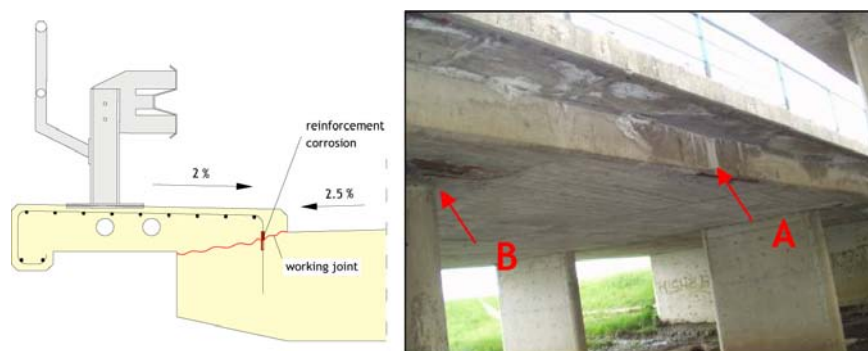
Cross section of the cantilever and deck slab edge with marked working joint and location of reinforcement corrosion; Photograph: A-water penetration through working joint, B-leaking underneath gully [1]
